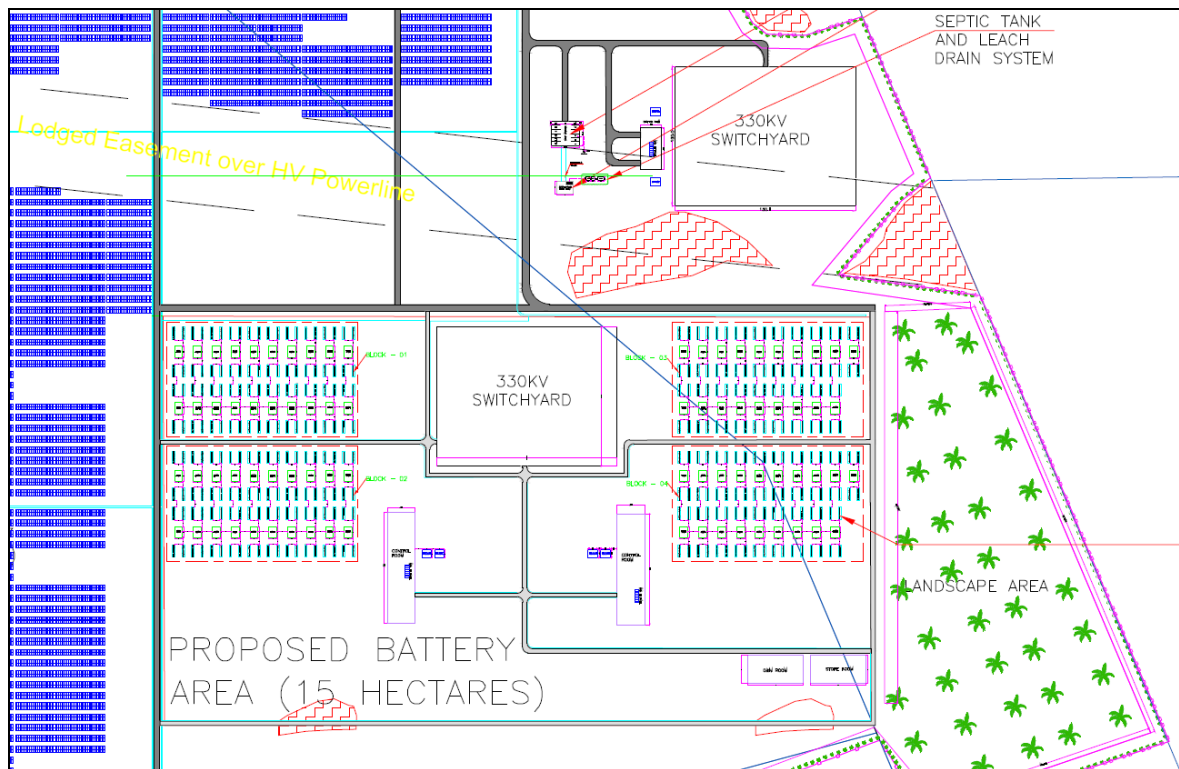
General amended layout illustrating BESS overlaid on aerial photo
